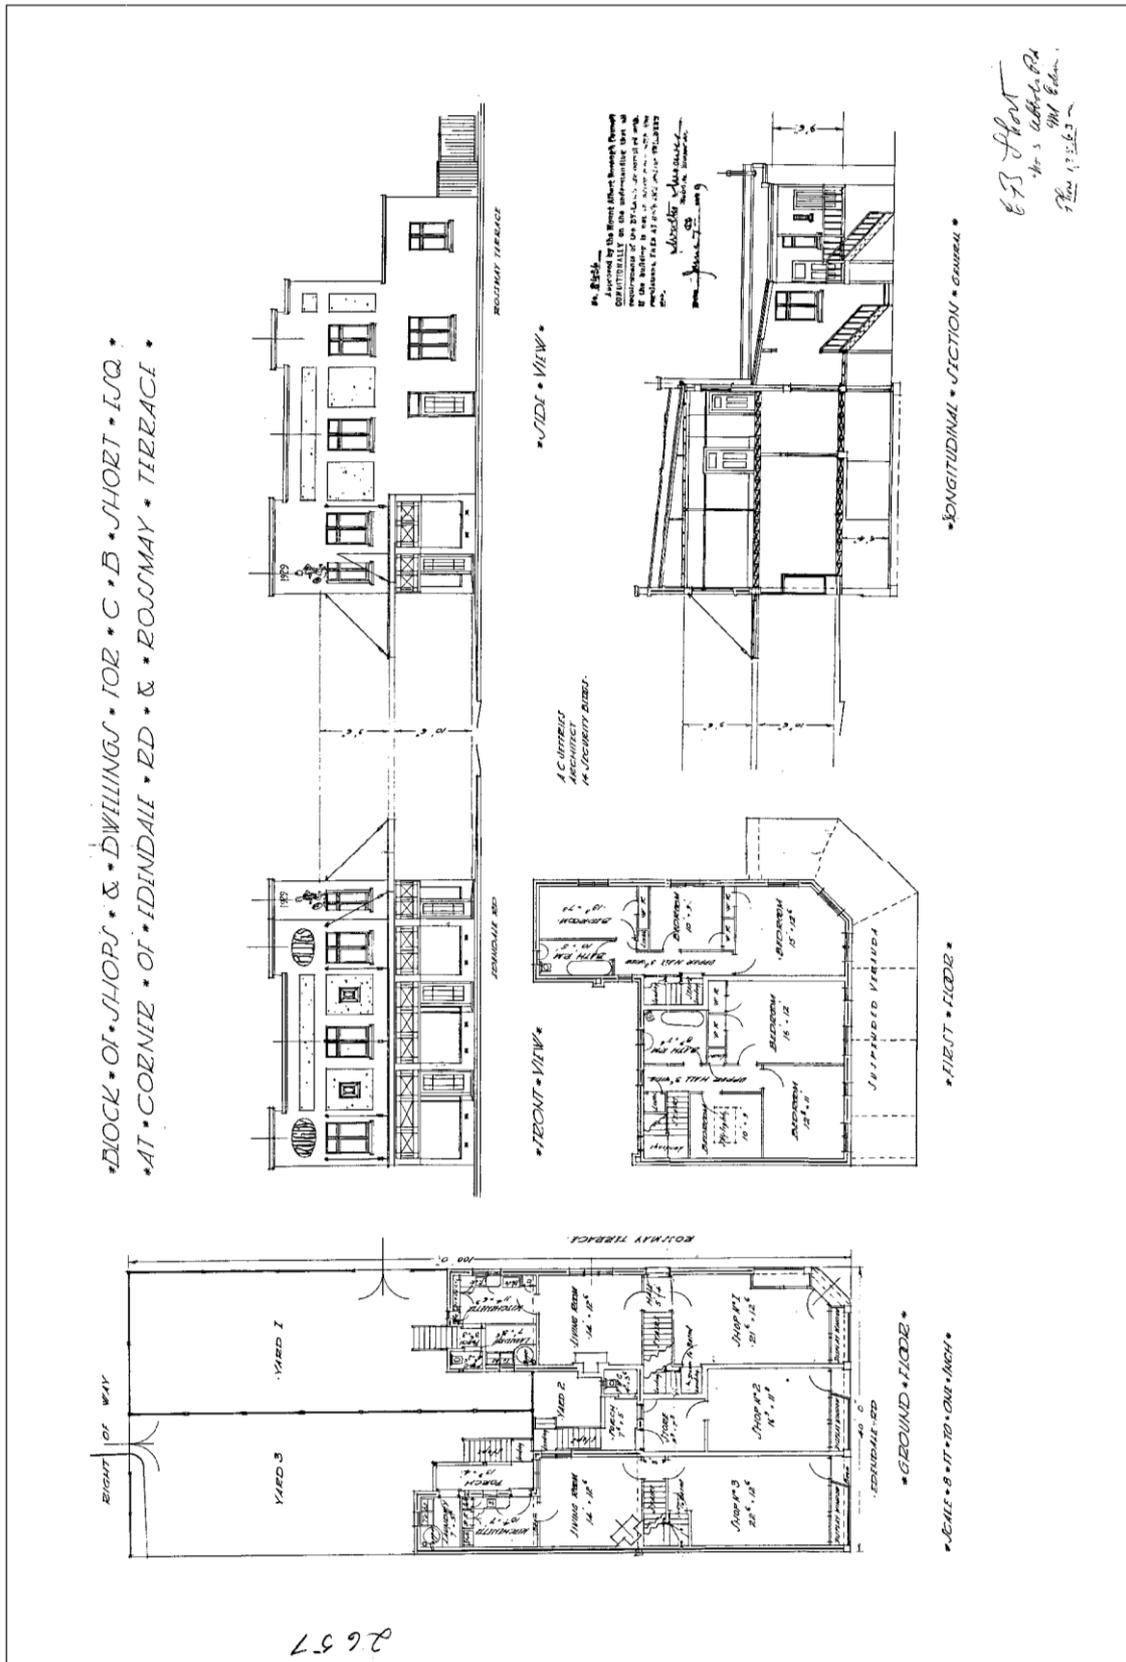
1929 Plans elevations and sections: Source: Auckland Council
